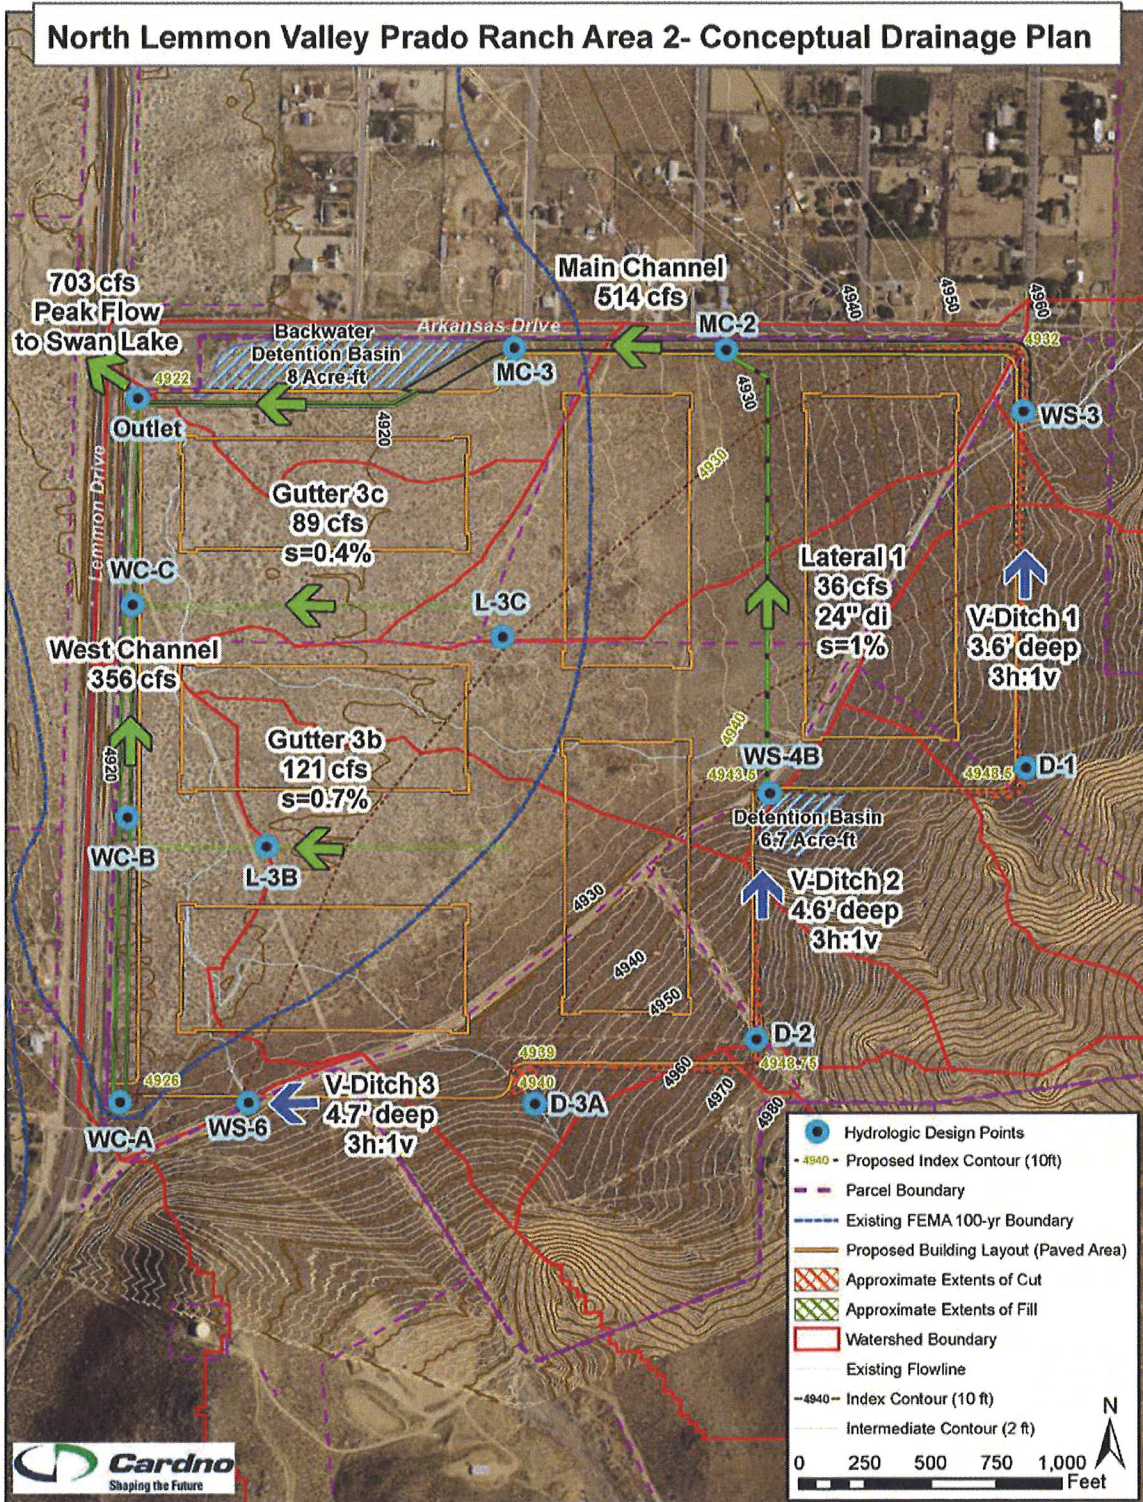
Conceptual drainage plan for the proposed Area 2 development.
